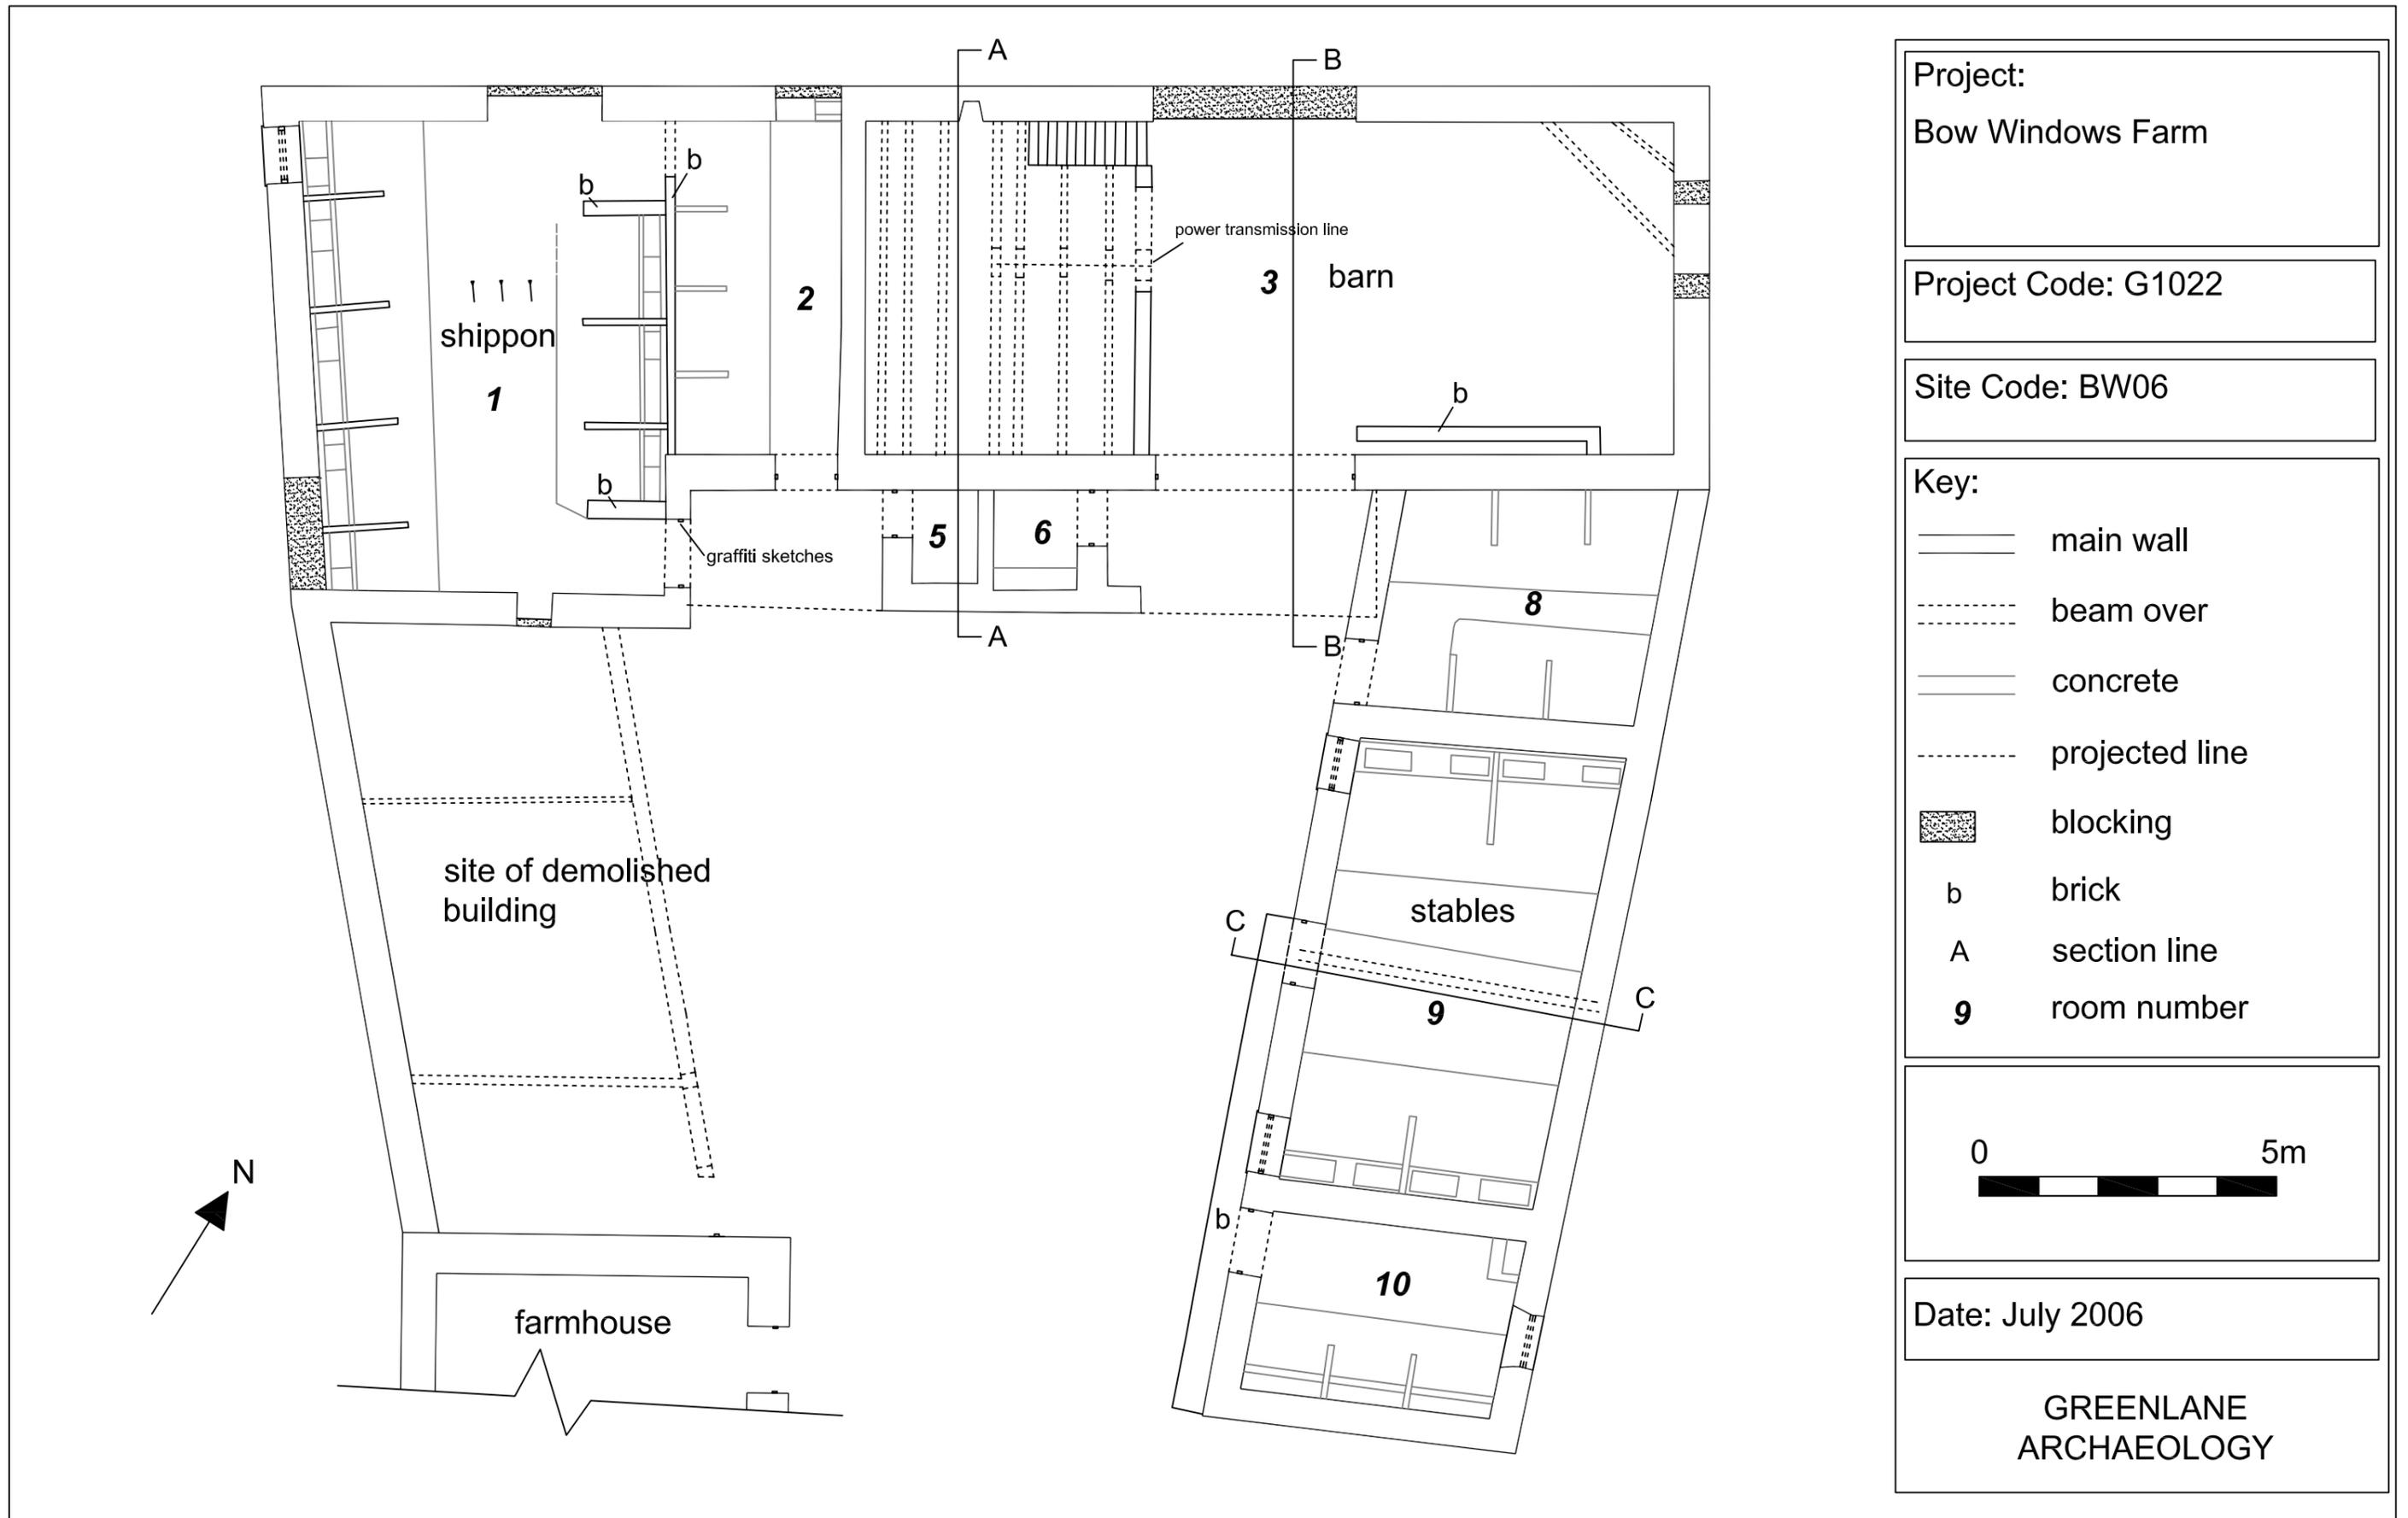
Ground floor plan of the combined barn and shippon and the stables
